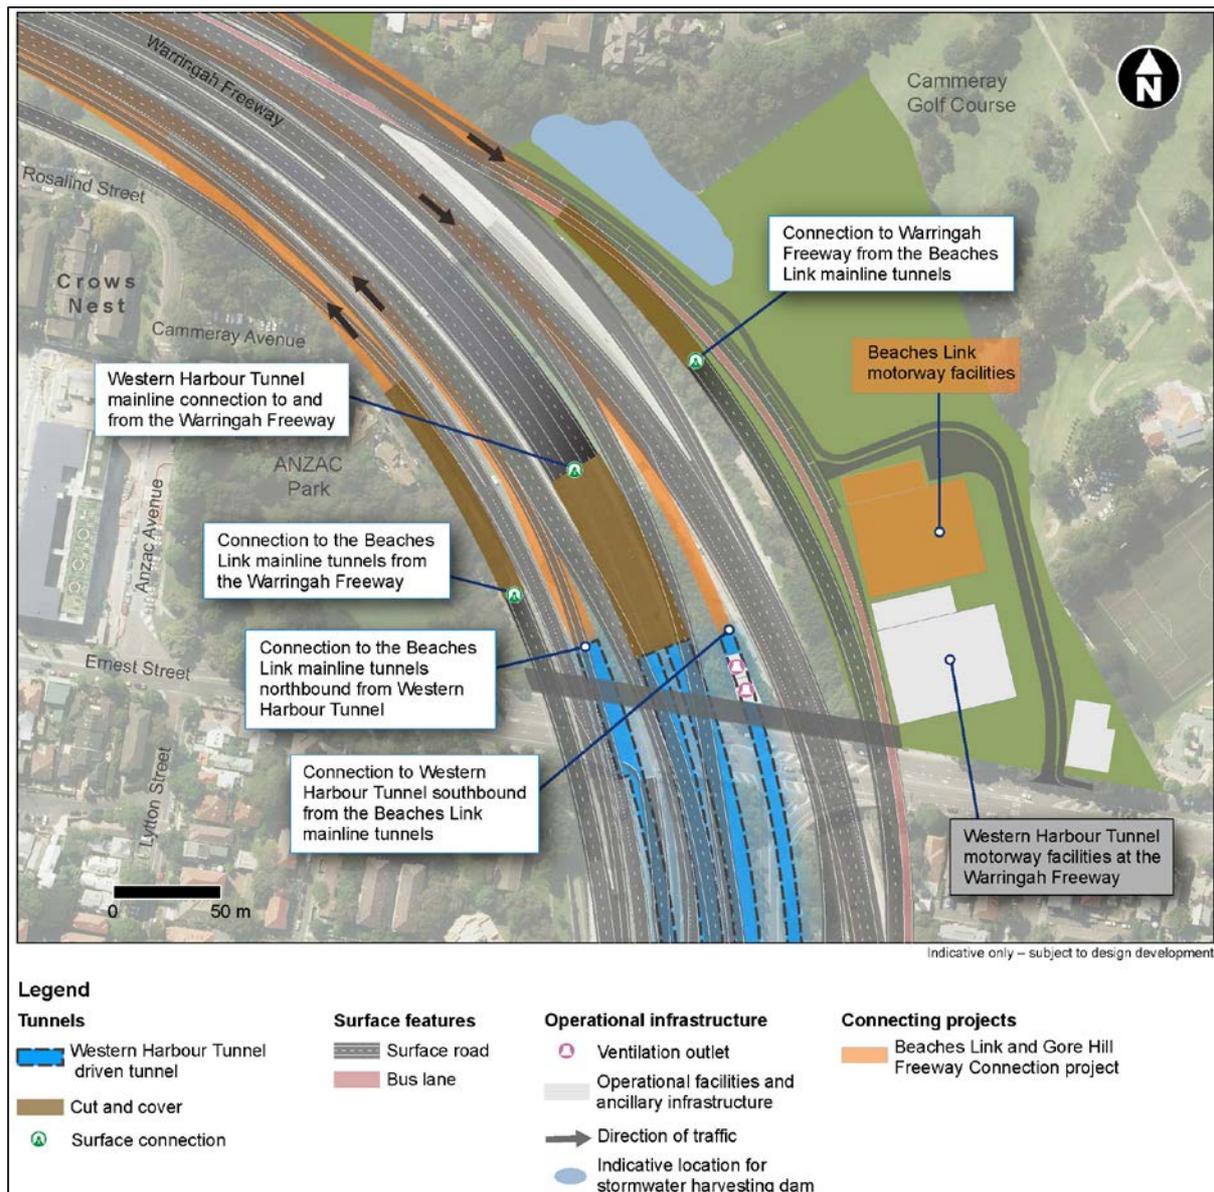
| Indicative Tunnel to Tunnel Connection at Cammeray (Source: EIS)
